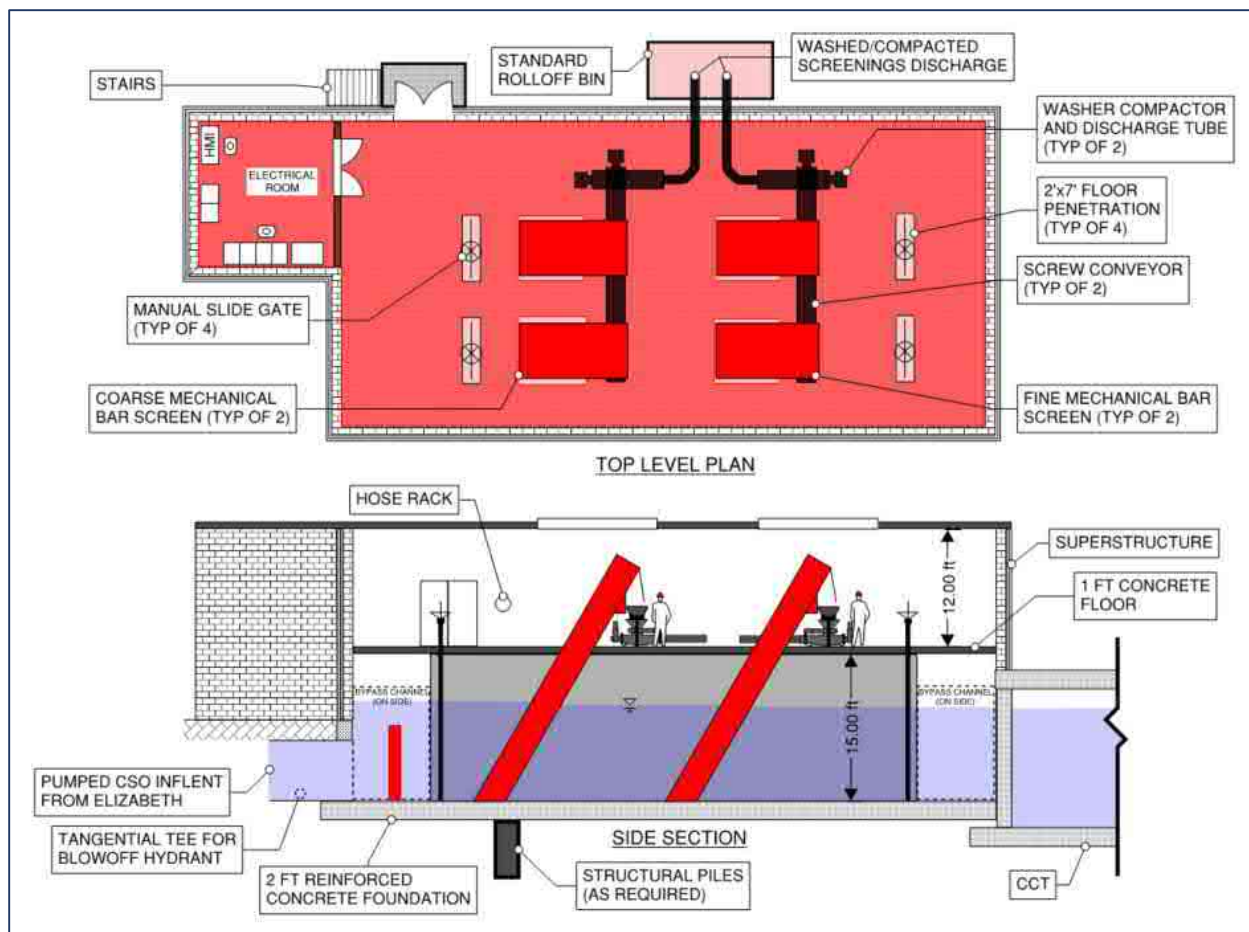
Screening Facility Conceptual Top-Level Plan and Section
